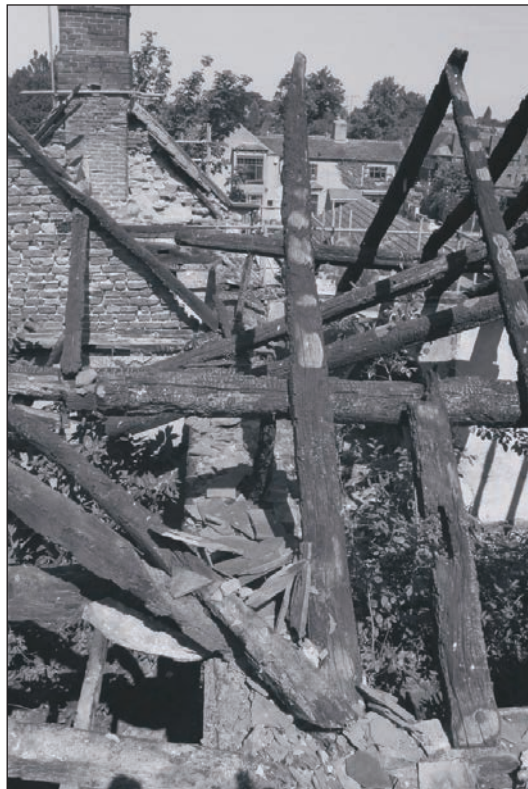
General view along wall head, east wall, Building 4 (Film 25.14)
